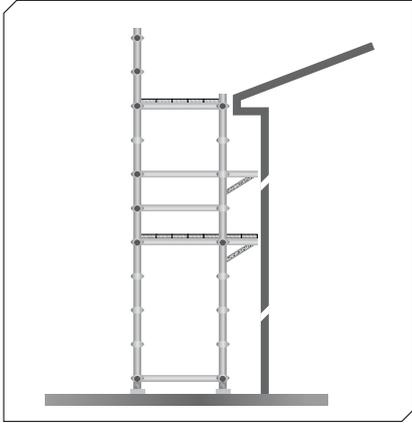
(a): Scaffolding platform at edge of roof with hop-up bracket for other trades.
